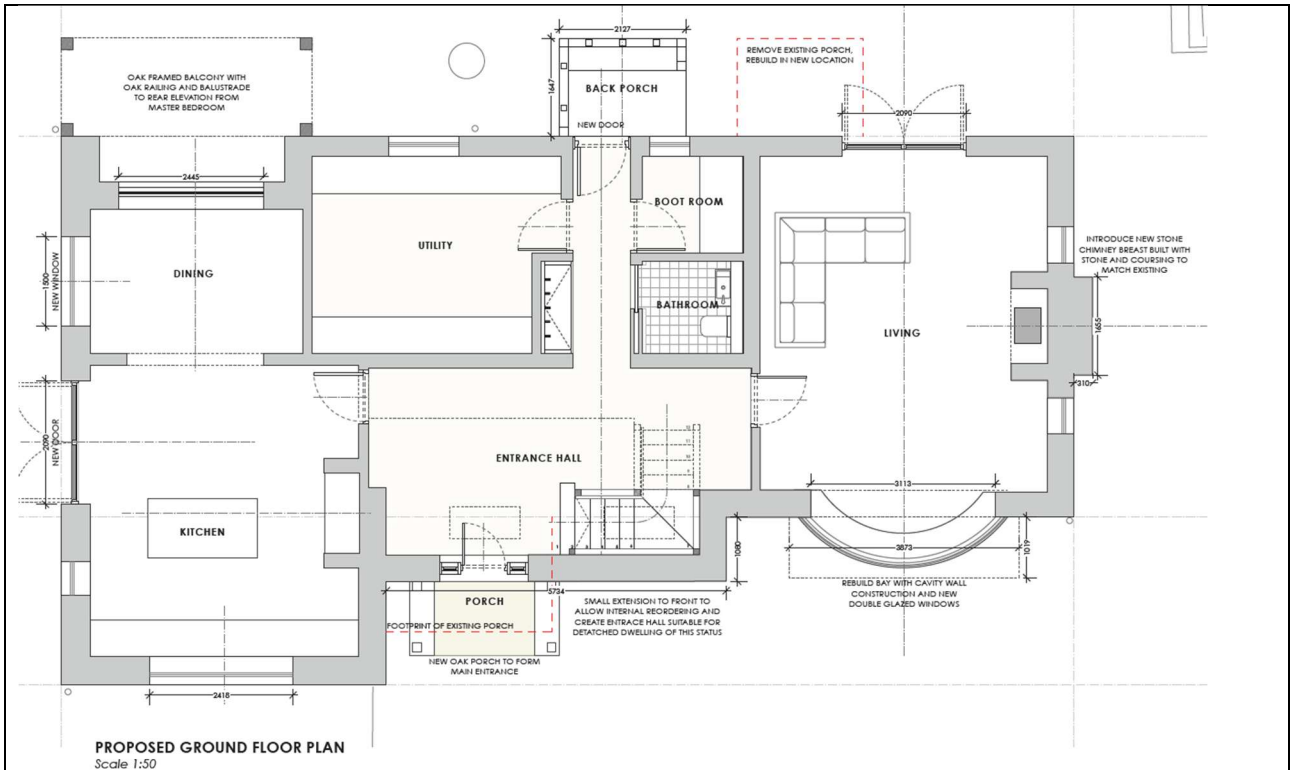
Proposed works GF drawing – (NWDC drawing )
